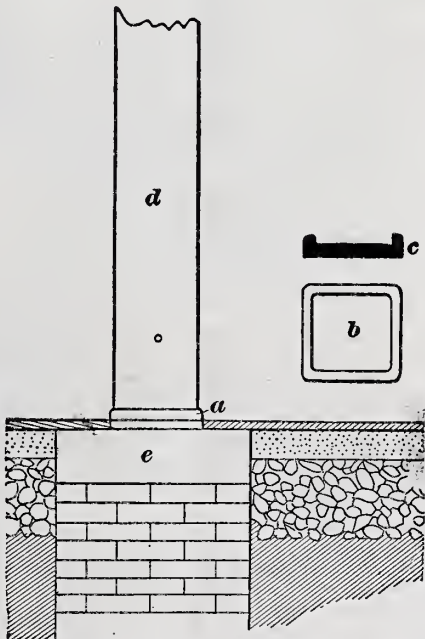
Column and Foundation.—Scale, 1/2 Inch to the Foot.
